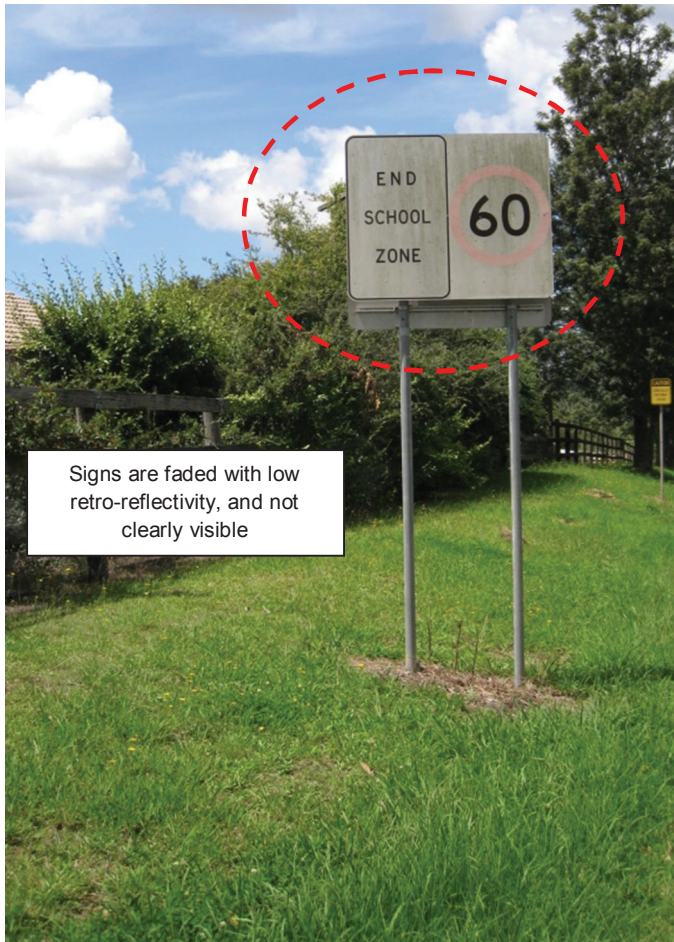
Jilliby Road, looking south toward the southern end of the 40 km/h school zone
